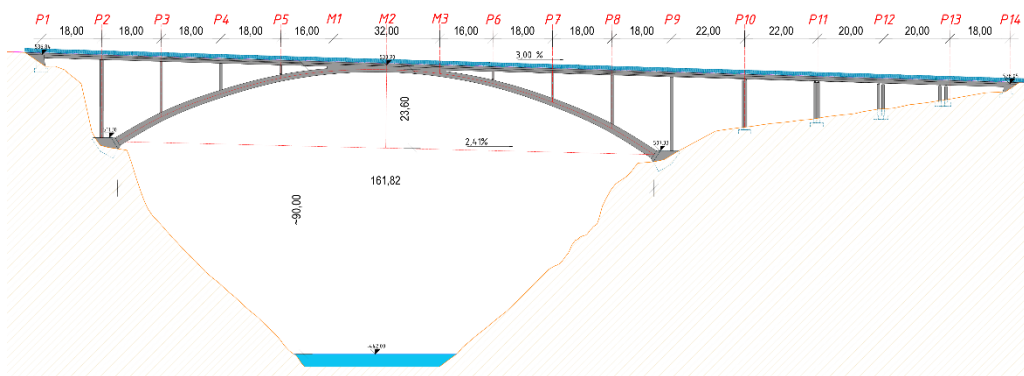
Longitudinal section - view of the arch bridge showing arch axis geometry, variable arch cross-section depth, and terrain profile with slopes
